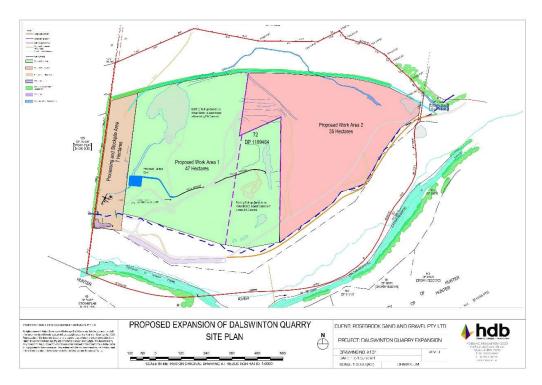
Proposed expansion of Dalswinton Quarry Source: HDB Town Planning and Design
